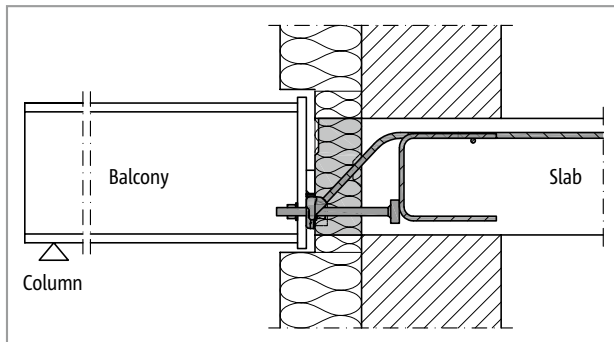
Schöck Isokorb® T type SQ: Connection to reinforced concrete inner slab; insulating element within the core insulation zone.
